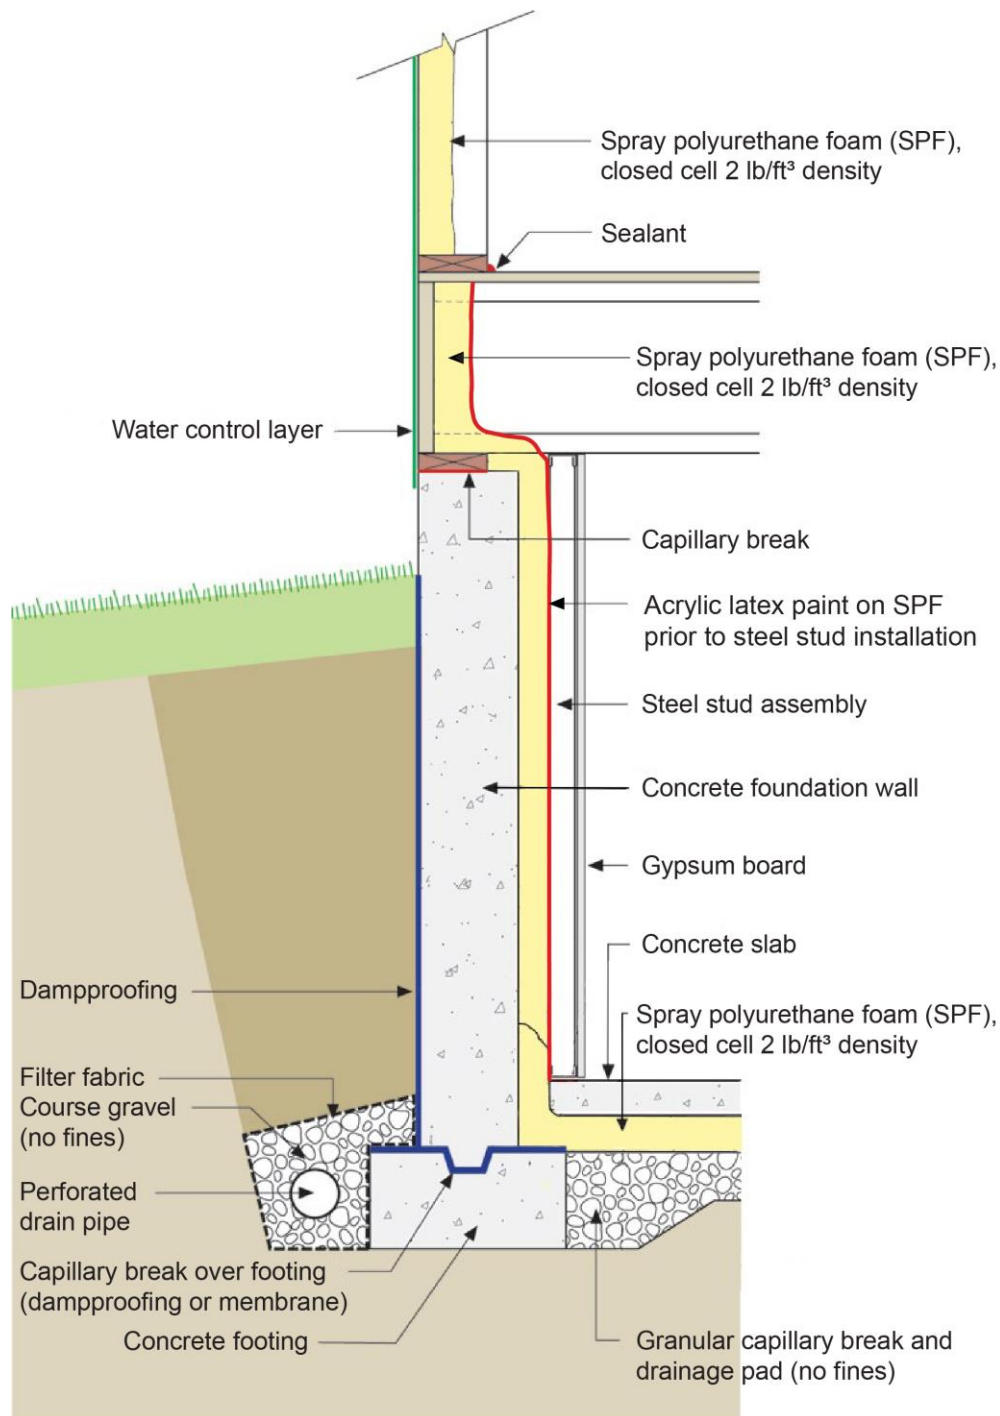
Basement - In basement construction, closed cell SPF (2 lb/ft³ density) can be used on the interior of concrete and concrete masonry unit (CMU) foundation walls with a metal stud wall interior “stand-off”.
